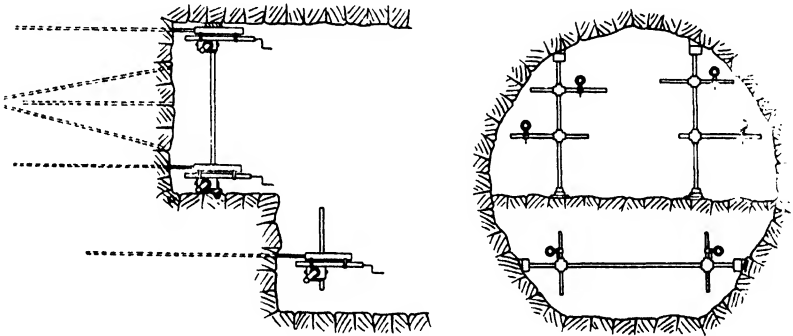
Column-and-bar set-up for horizontal drilling of heading and bench.
